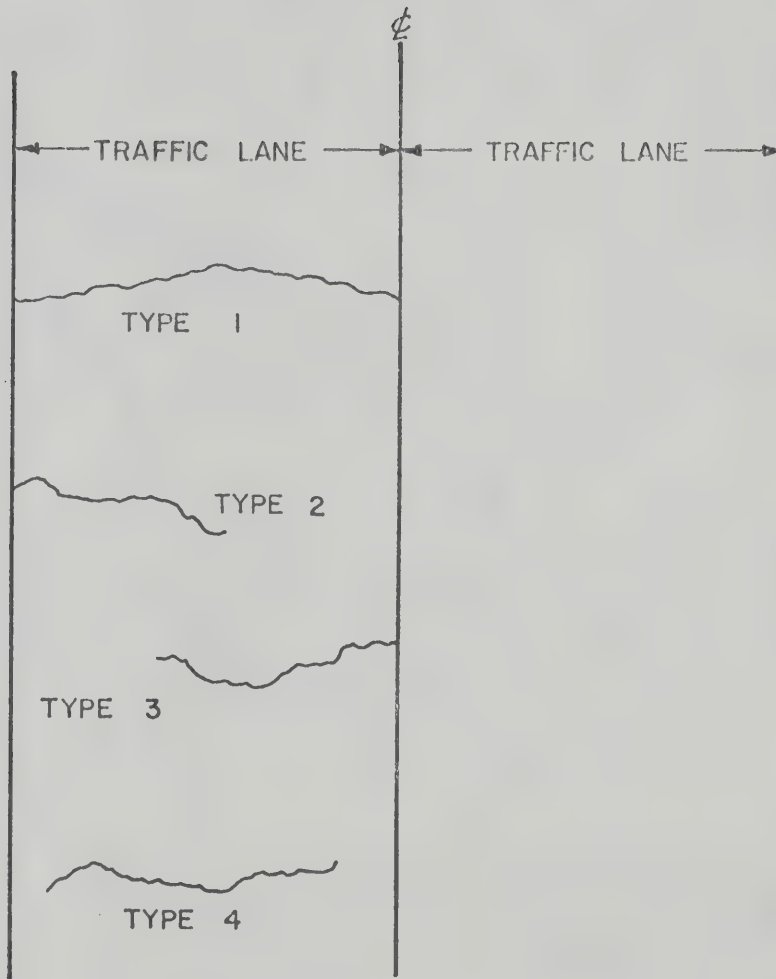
TYPES OF TRANSVERSE PAVEMENT CRACKS (after McLeod; 1968)
